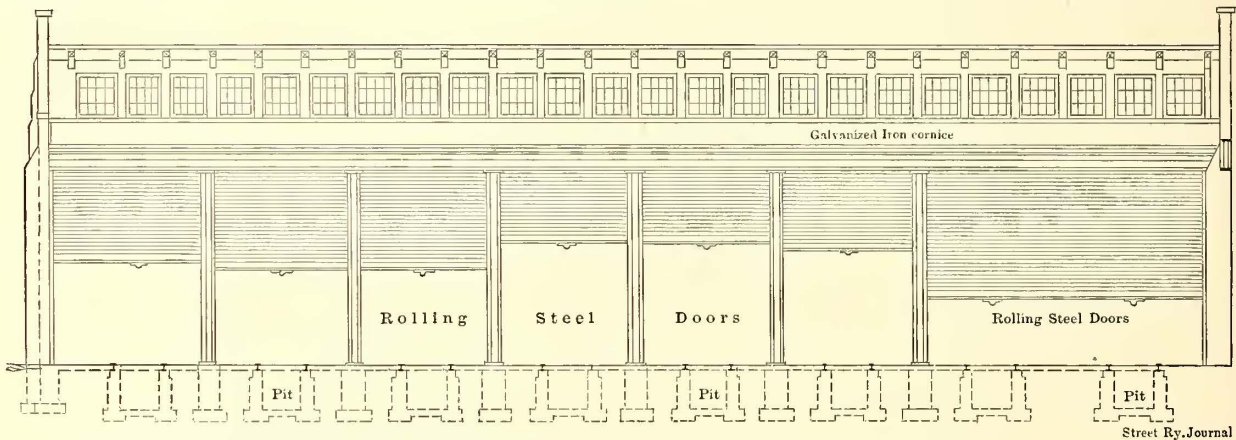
FRONT ELEVATION OF THE INSPECTION BUILDING AT THE OPEN END
